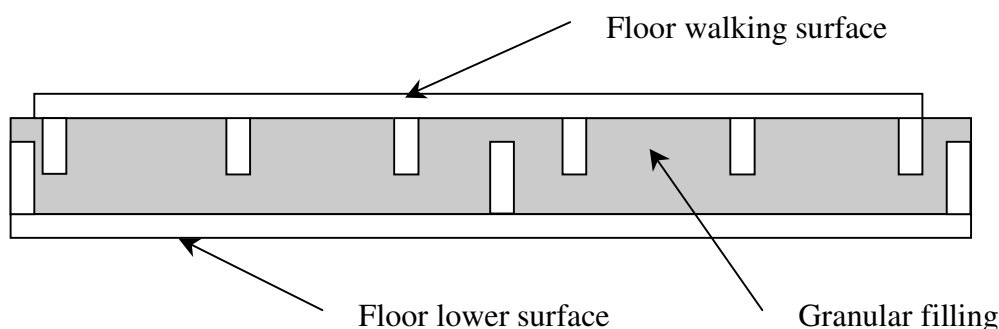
Swiss trial timber floor with upper floor surface floating on granular material (Walk and Keller, 2001).
